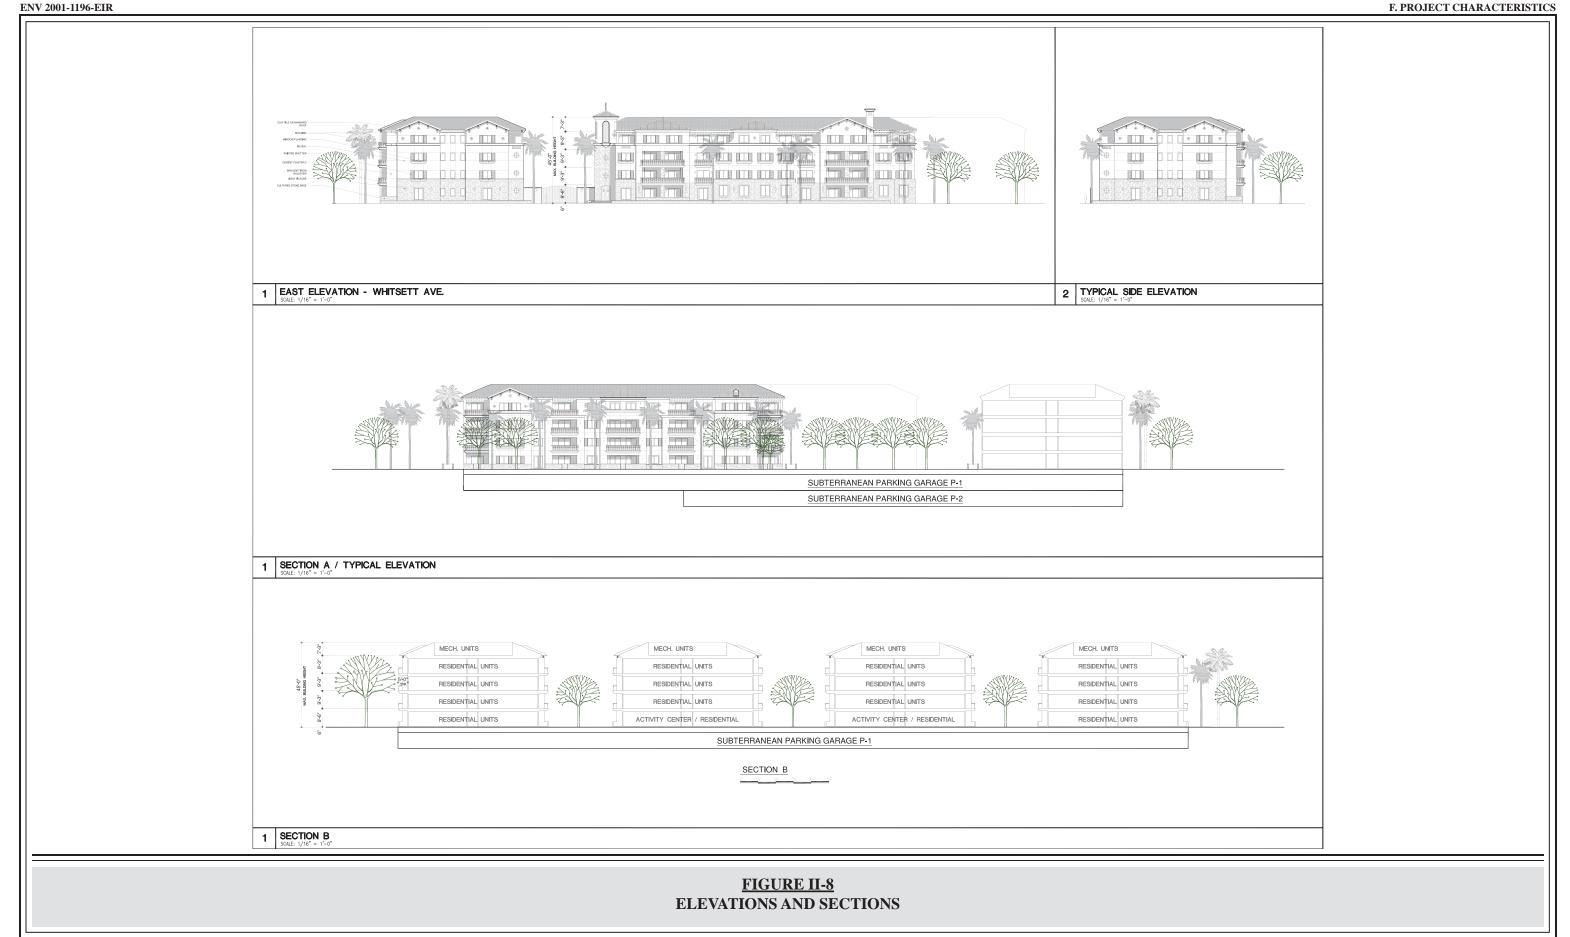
Proposed Site Plan, Figure II-8: Elevations and Sections, Figure II-9: Buildings 1 Through 5 Typical Floor Plan, and Figure II-10: Building 6 Typical Floor Plan, show the general configuration for the six proposed buildings that comprise the senior living center campus on Lot 2. All buildings will be four stories tall and up to 45 feet in height. Two buildings will contain 30 dwelling units, two buildings will contain 35 dwelling units, one building will contain 31 units, and one building will contain 39 units for a total of 200 units. All buildings will contain both two-bedroom and one-bedroom condominium units. Two buildings will have direct frontage on Whitsett Avenue and will be directly visible from the street, with other buildings visible in the back. The two buildings fronting on Whitsett Avenue will contain common activity space on the entire ground level of the buildings. Common activity space will also partially occupy the ground floors of two additional buildings. The entrances into all the buildings will face the interior courtyard of the development, which will be fenced and gated.
